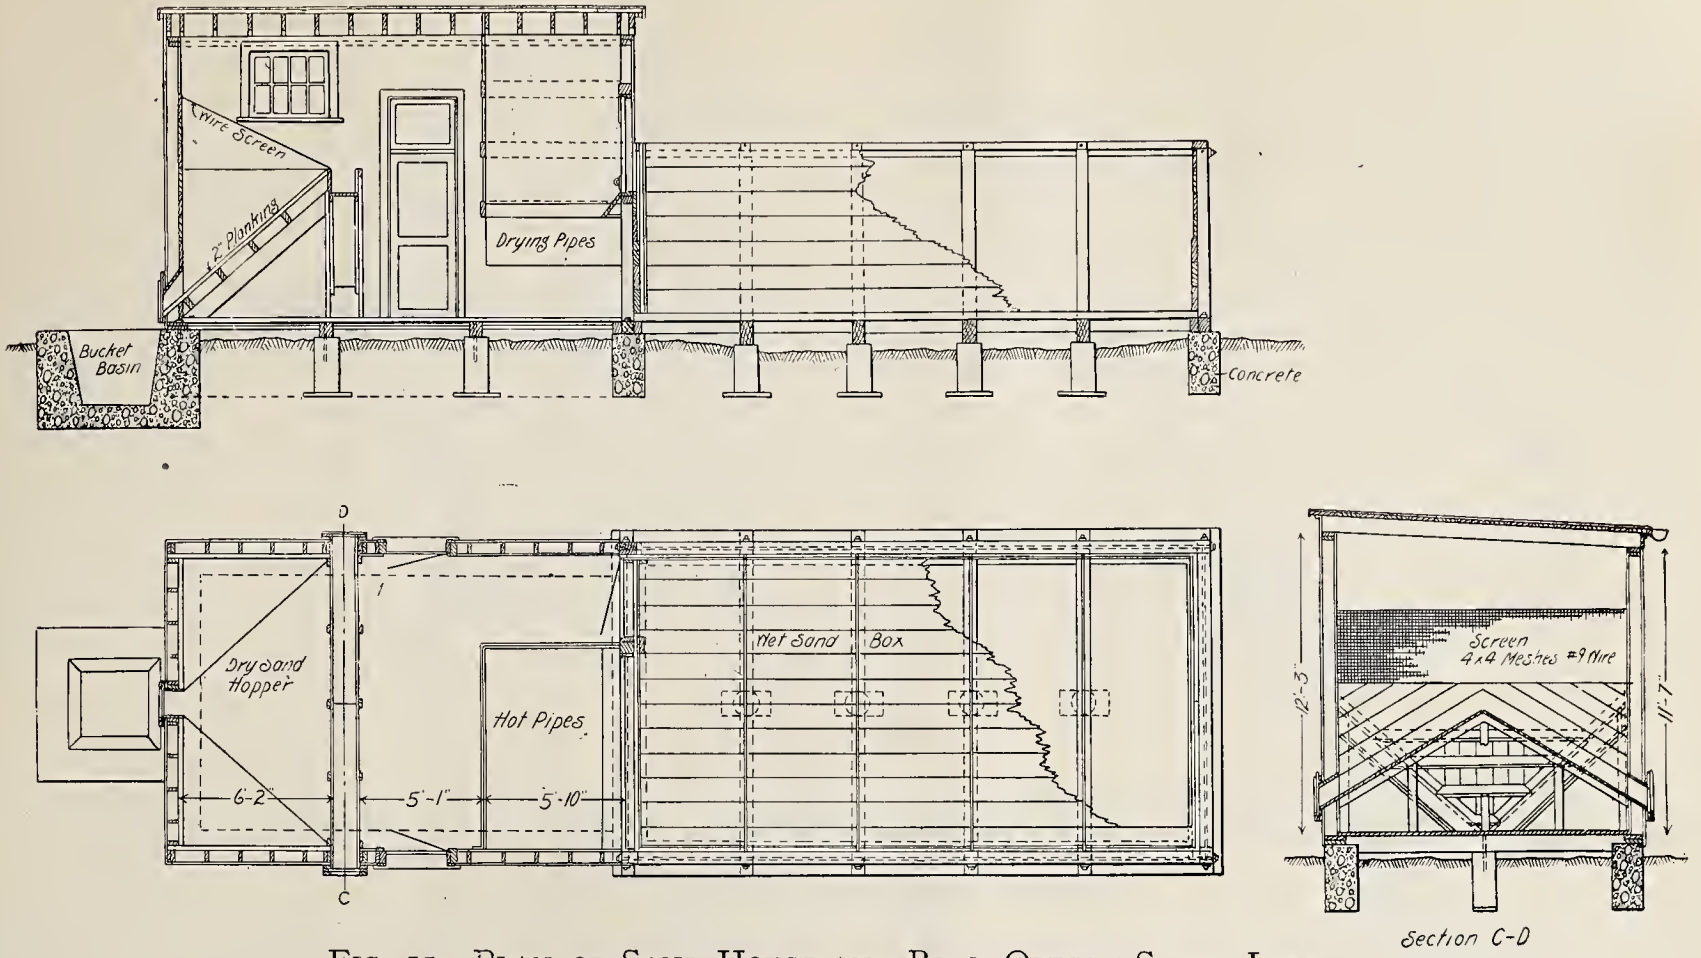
PLAN OF SAND HOUSE AND BINS, OREGON SHORT LINE.
